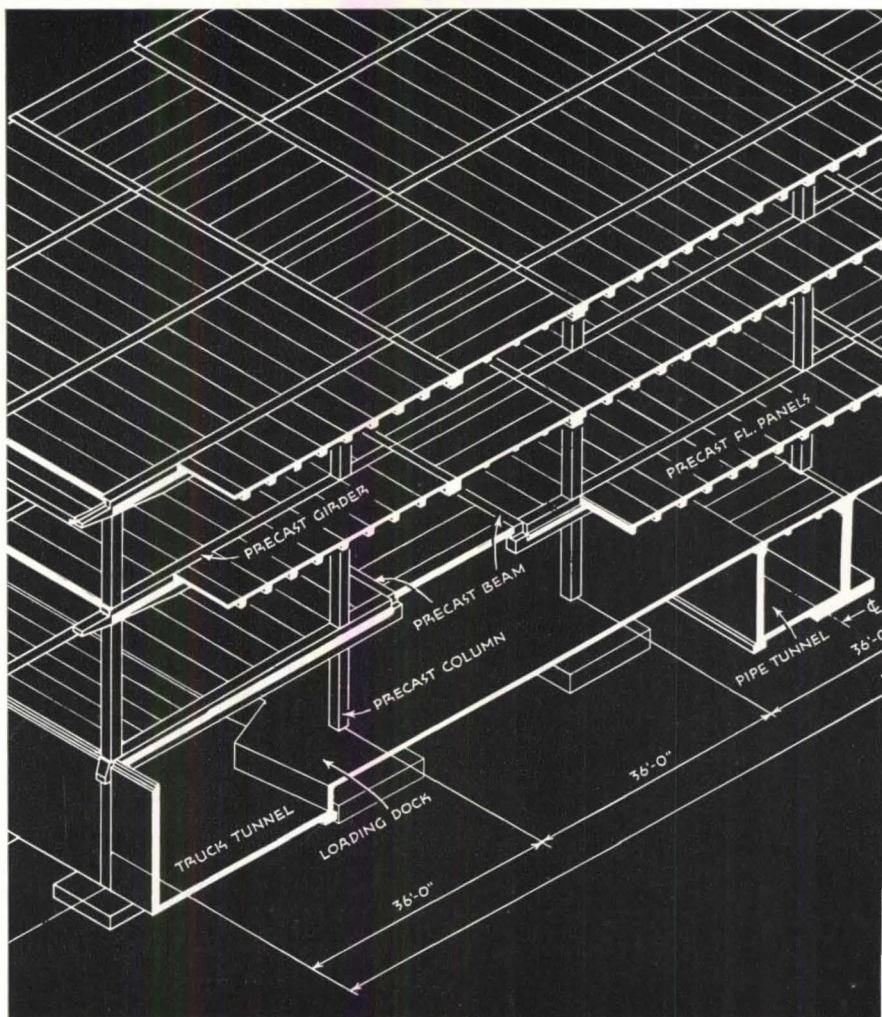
design for tenant buildings of project in Detroit (same owners, architects, and engineers as design above) which is a compromise between cast-in-place and precast elements, in order to conserve steel.
